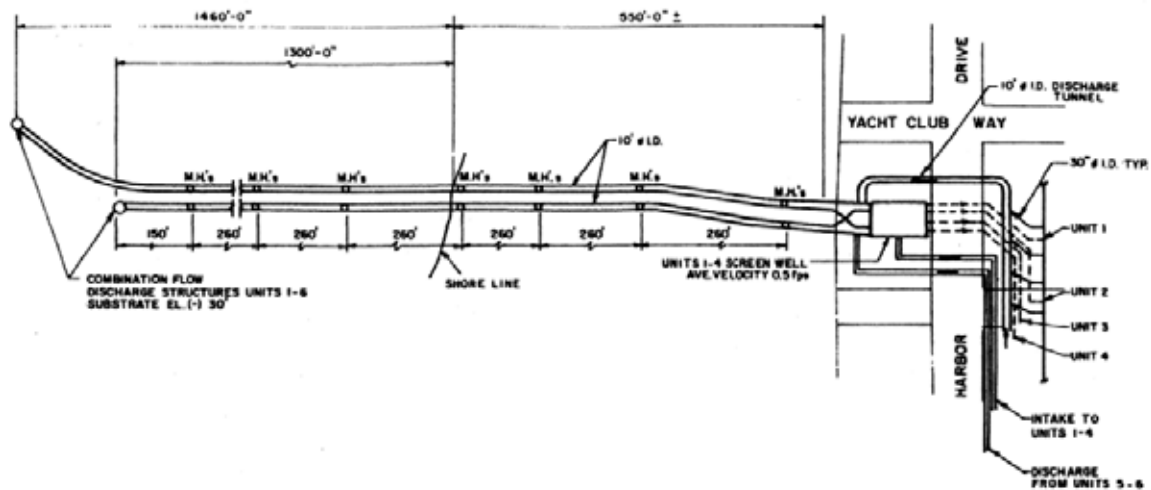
AES Redondo Beach units 1 to 6 cooling water tunnels (SCE, 1983).
